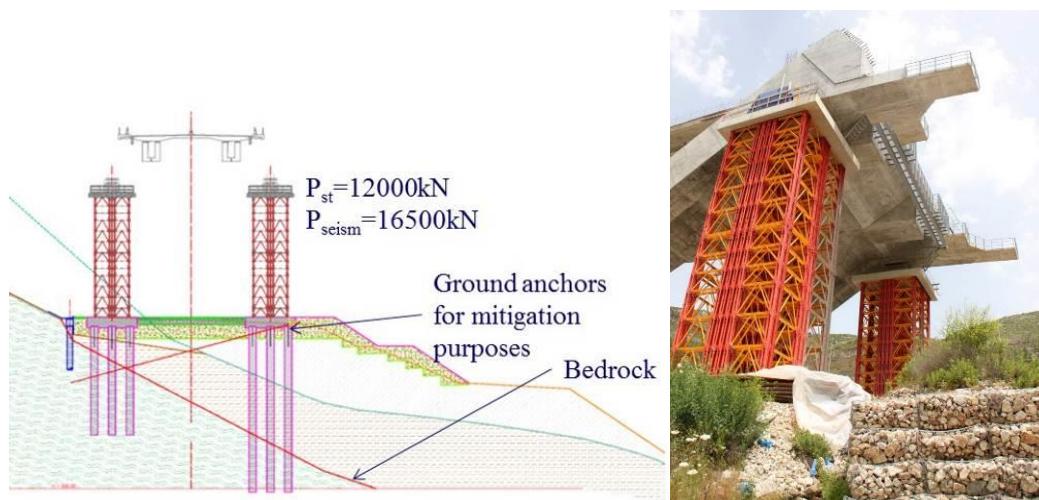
Arrangement of the MT towers beneath the curved struts of the bridge pier.
